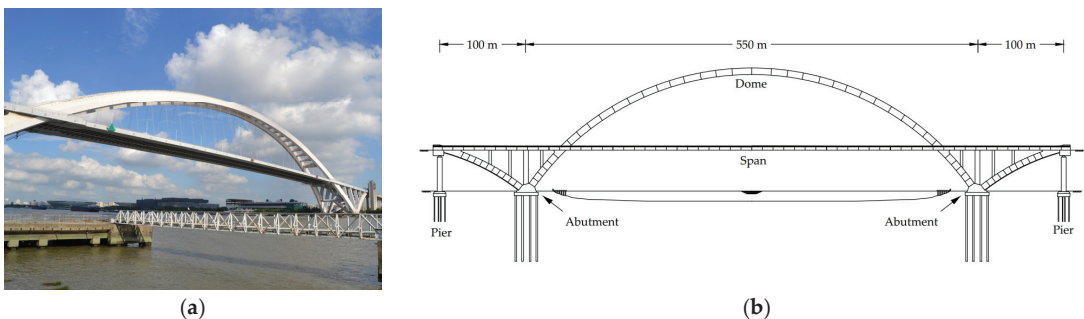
(a) A picture of the Lupu Bridge, and (b) elevation view of the bridge with main dimensions.
